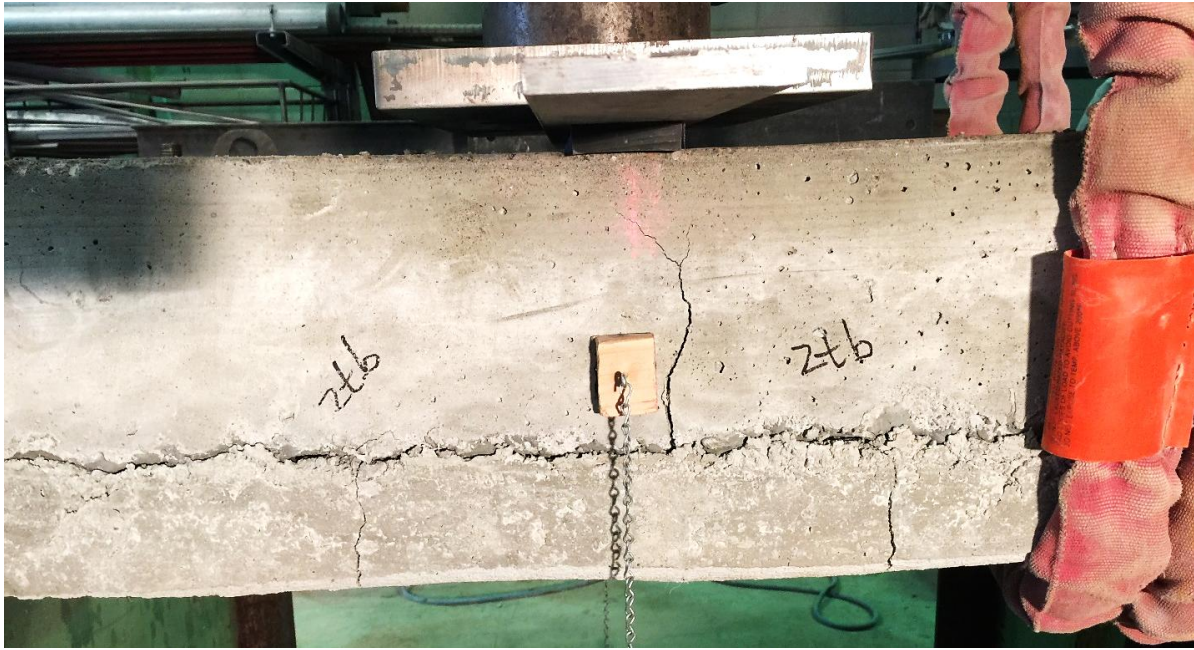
Case 2 negative bending flexural test specimen failure at concrete bond interface
